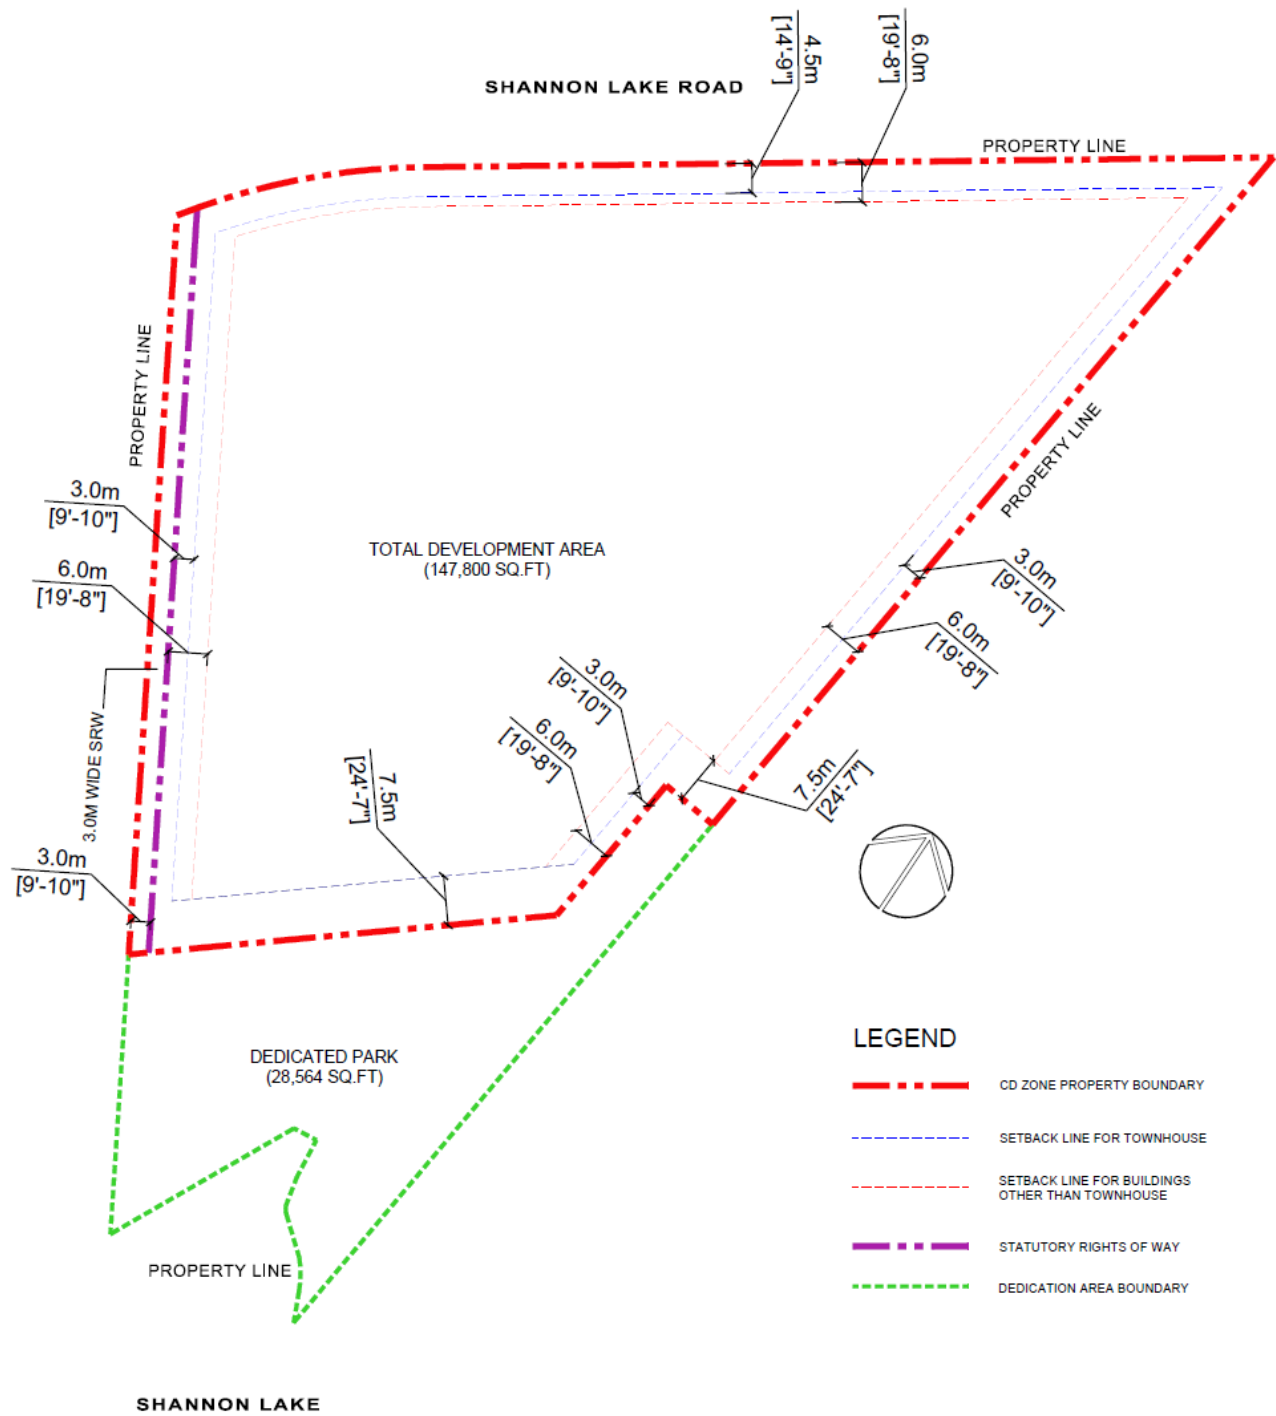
DEVELOPABLE AREA AND SETBACK PLAN
